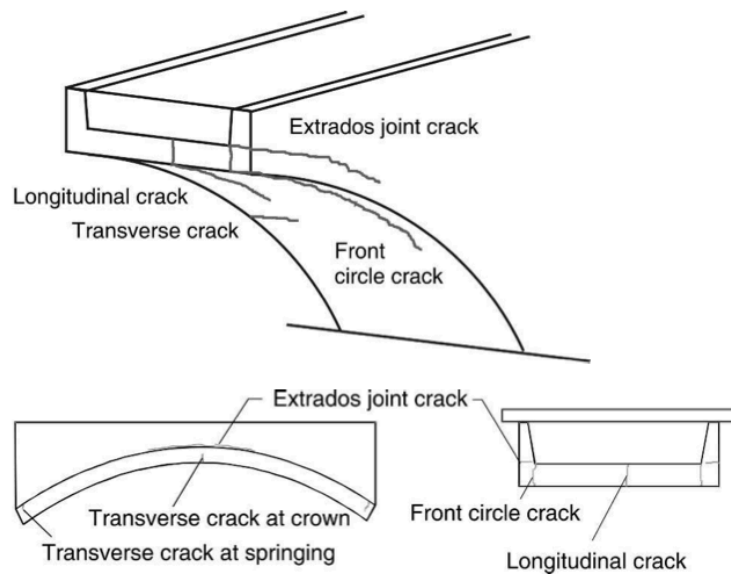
Typical cracking in masonry arch bridge according to [Bienert, 1976], taken from [Proske and Van Gelder, 2009]
